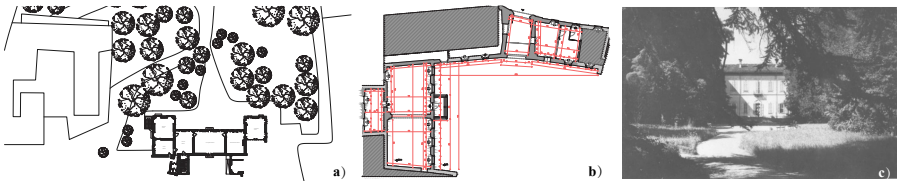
a) masterplan of the building with garden; b) building courtyard and details c) Building from the garden
